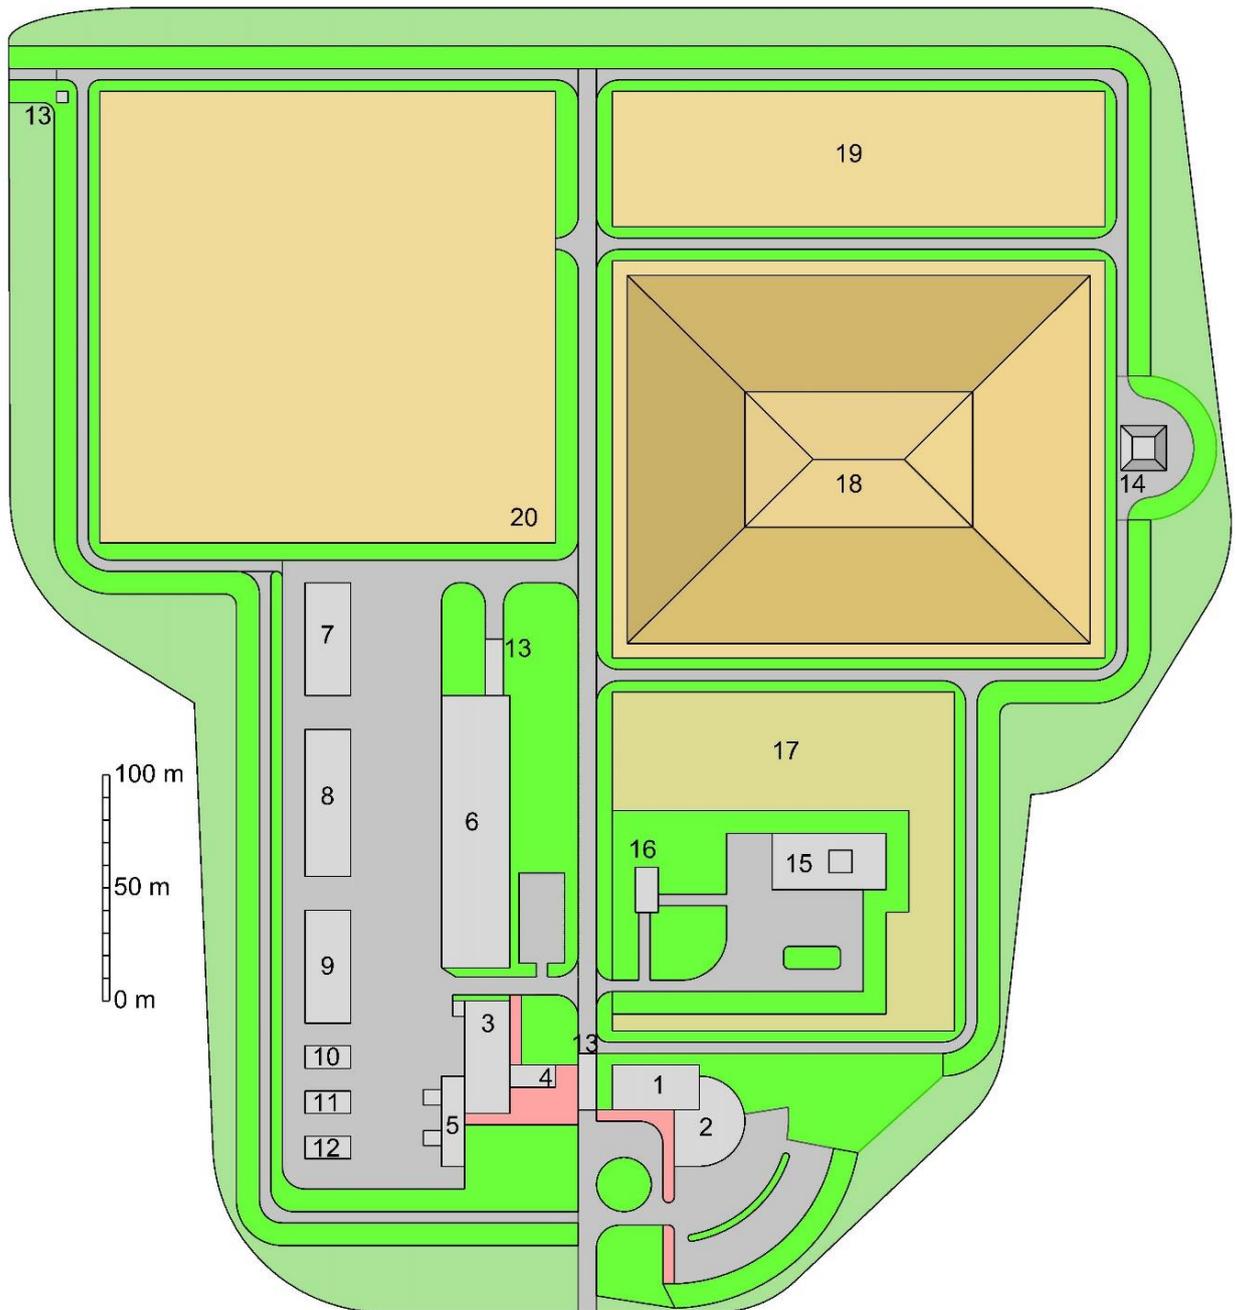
Buildings at the disposal site: 1) Office building 2) Visitor centre, 3) Operation building, 4) Guard, 5) Ventilation building, 6) Tunnel portal building, 7) Packaging plant area, 8) Waste reception building, 9) Maintenance and storage hall, 10) Research building, 11) Backup power supply, 12) Refuelling station, 13) Control, 14) Sedimentation pool option, 15) Emplacement building, 16) Base, 17) Deep borehole area, 18) Landfill repository option, 19) Container laydown area option, 20) Storage/construction area. Figure AINS.
